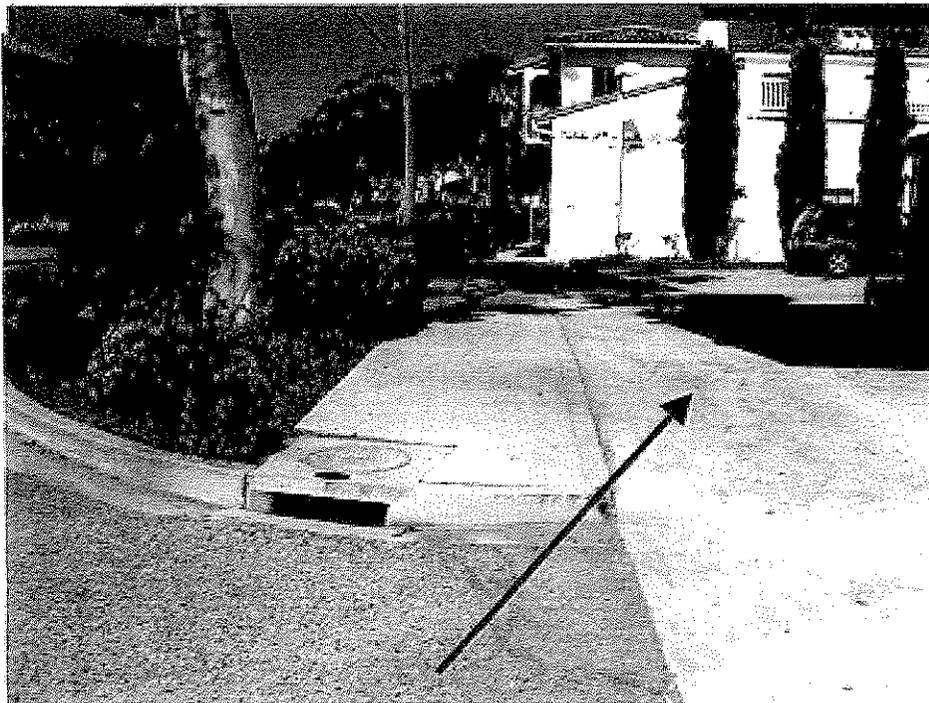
Note the manhole cover and storm drain on the east end of the sidewalk. The concrete by the pumps is new (arrow).
